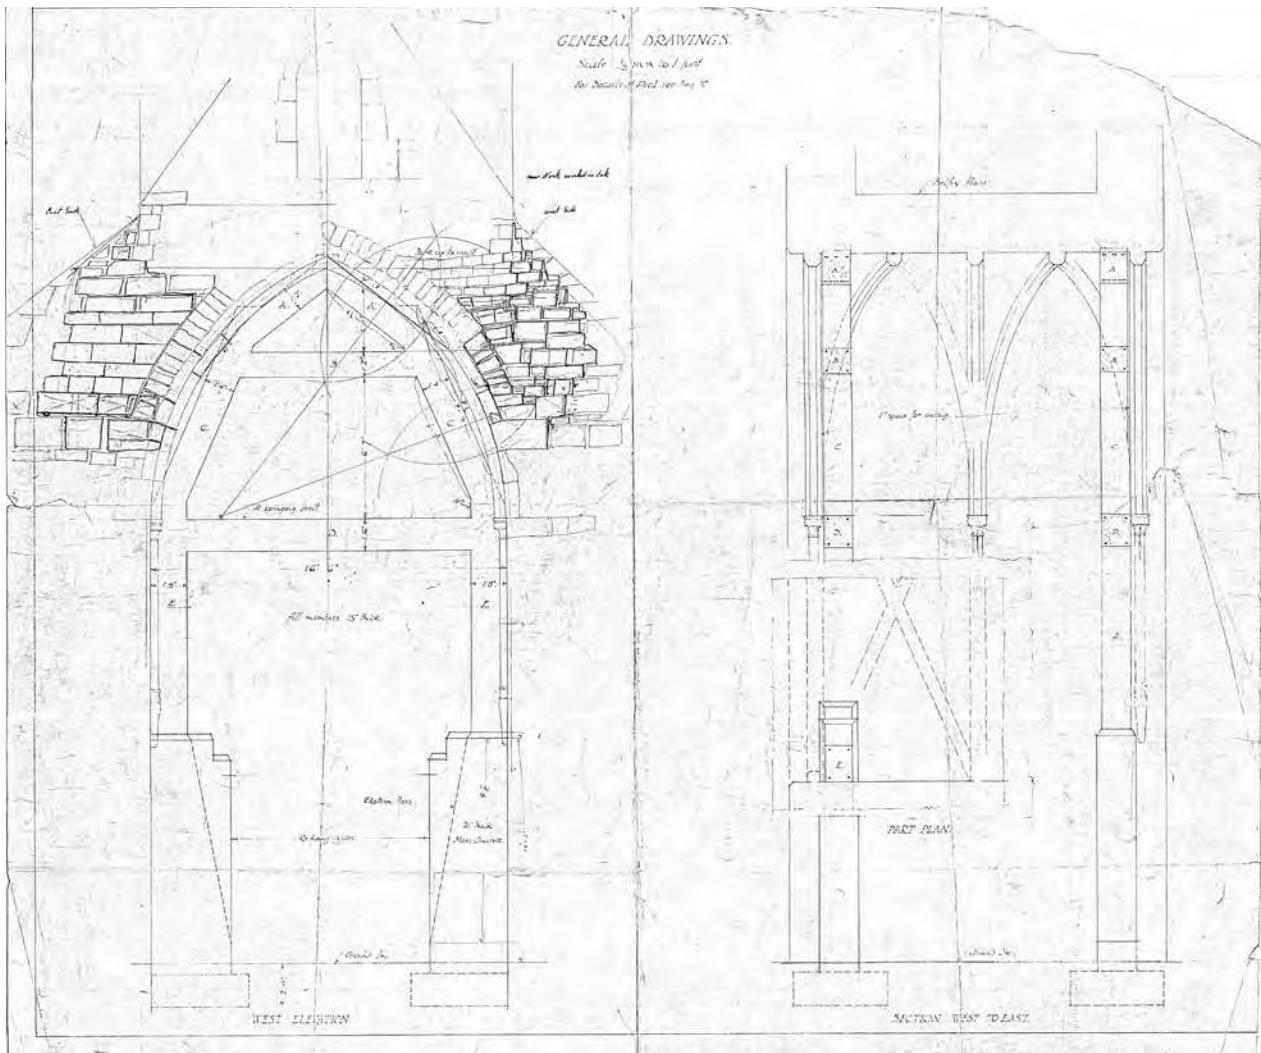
General drawings from 1927 showing the proposed concrete structure to the underside of the Tower (OPW Archive)
